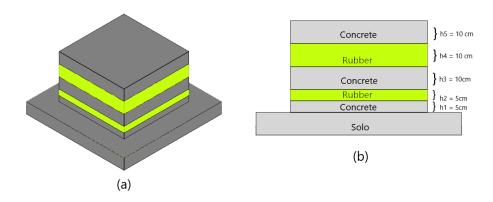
Periodic Foundation. (a) Periodic foundation: Block with 5 layers - concrete and rubber. (b) Dimension of each layer.
